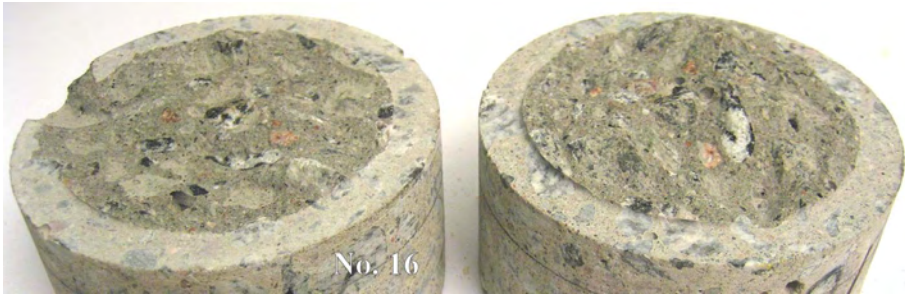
Photograph showing the failure surface for test No. 16 after fatigue test. One larger stone has loosened from the notch.
